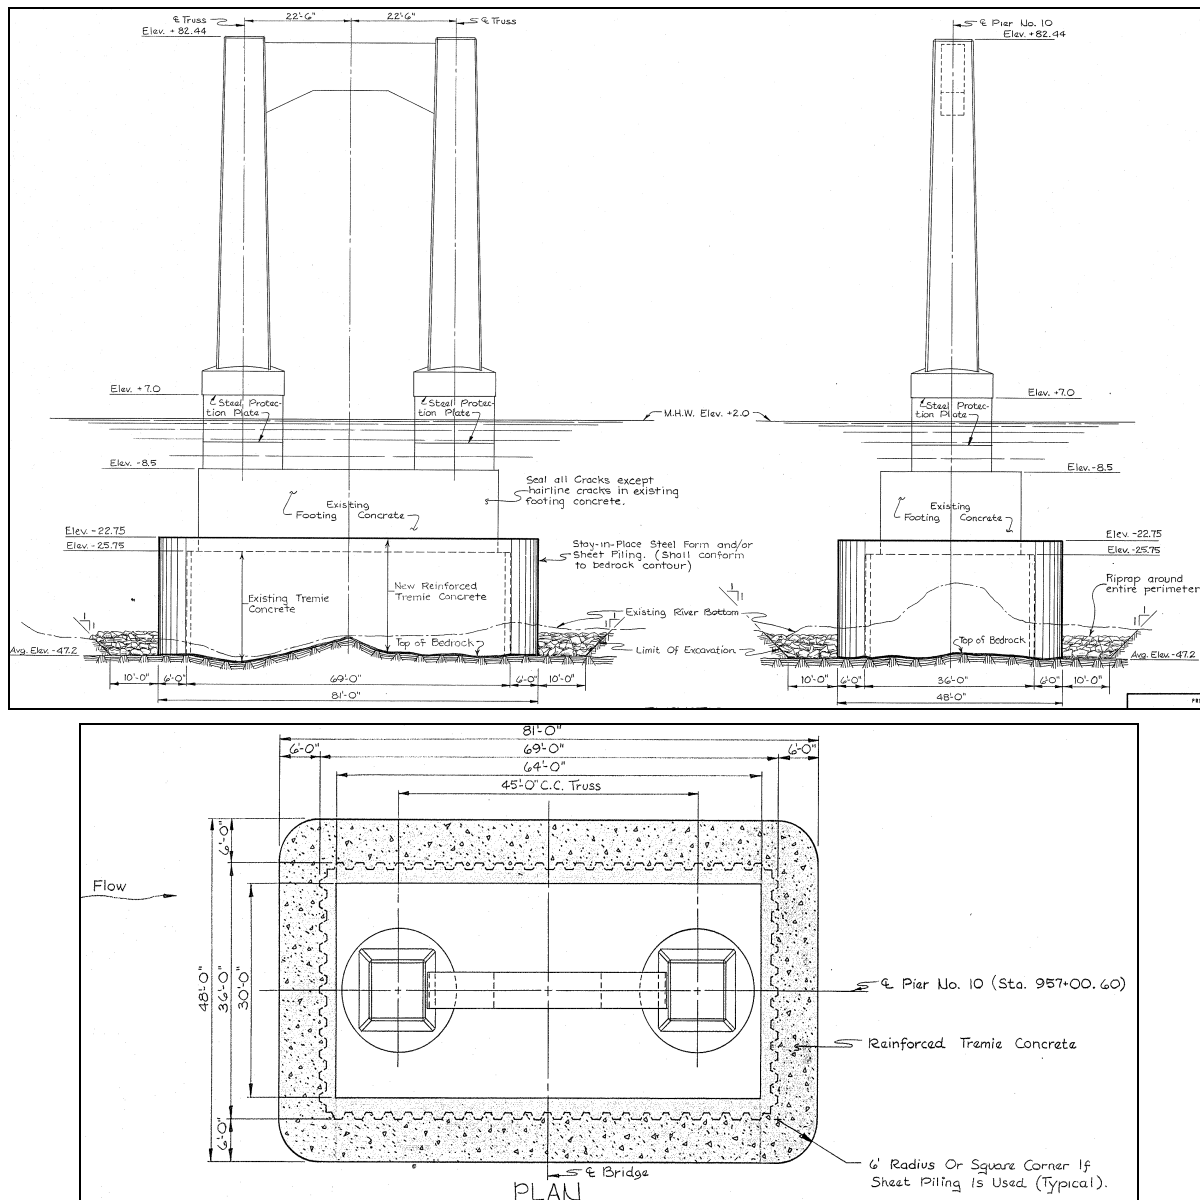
Bridge Plans – Longitudinal and Transverse Elevation and Plan View of Typical Channel Pier
